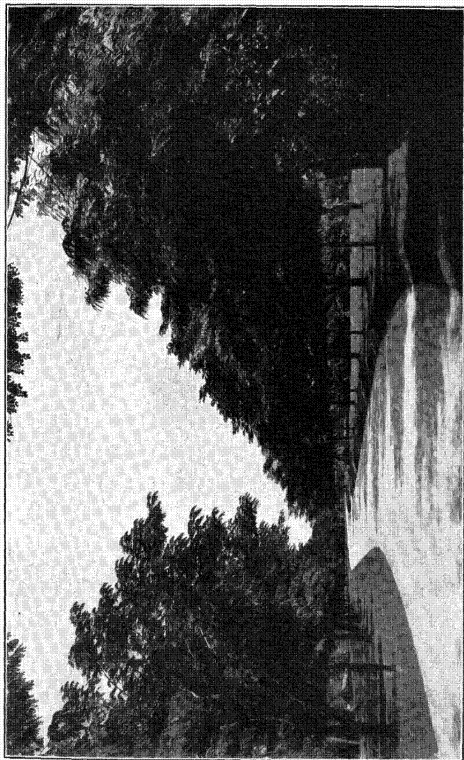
PLATE XXXIV. DRIVEWAY AT CEMENTERIO DEL NORTE, MANILA.
